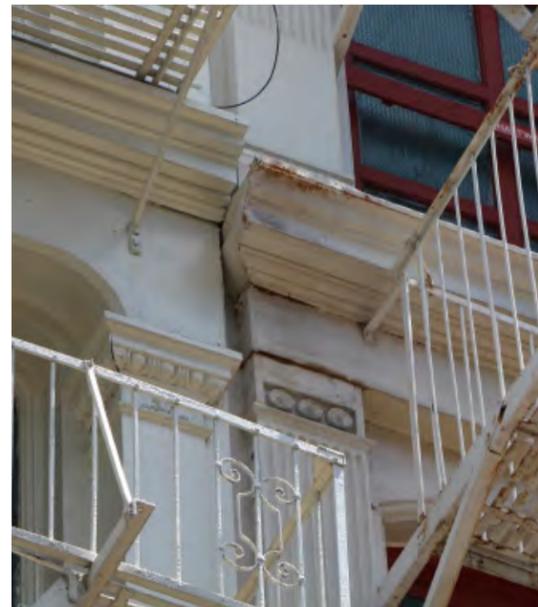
Fifth floor, north end. Signs of corrosion at cast iron joints, pilaster capital missing.
